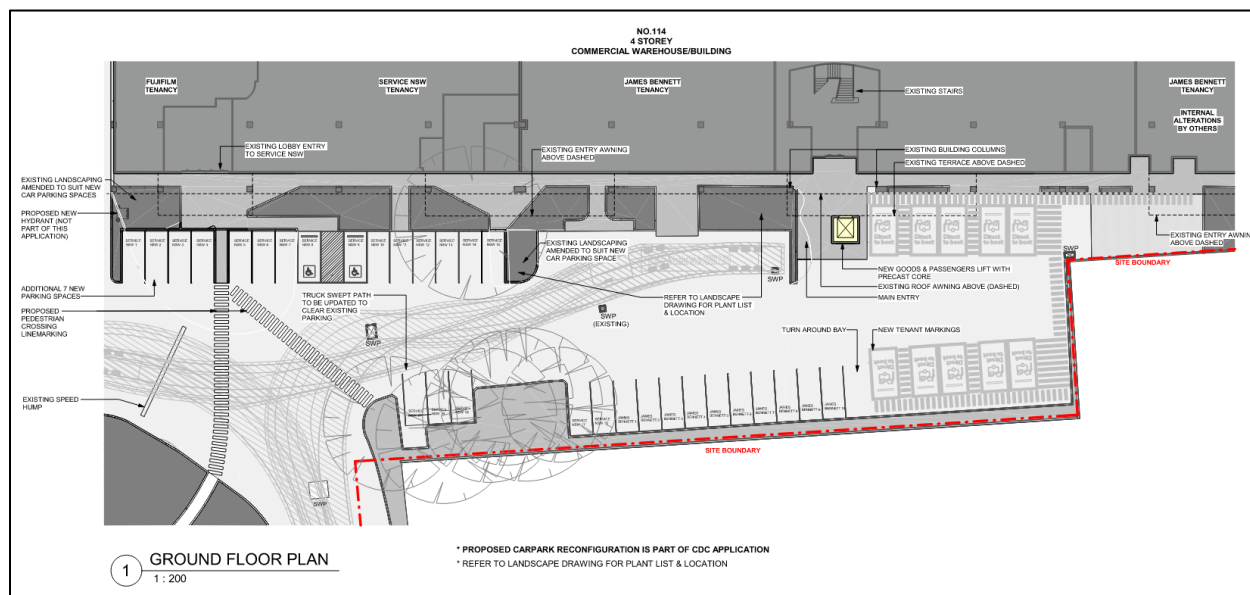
Site Plan (Source: Reid Campbell, 2024)
